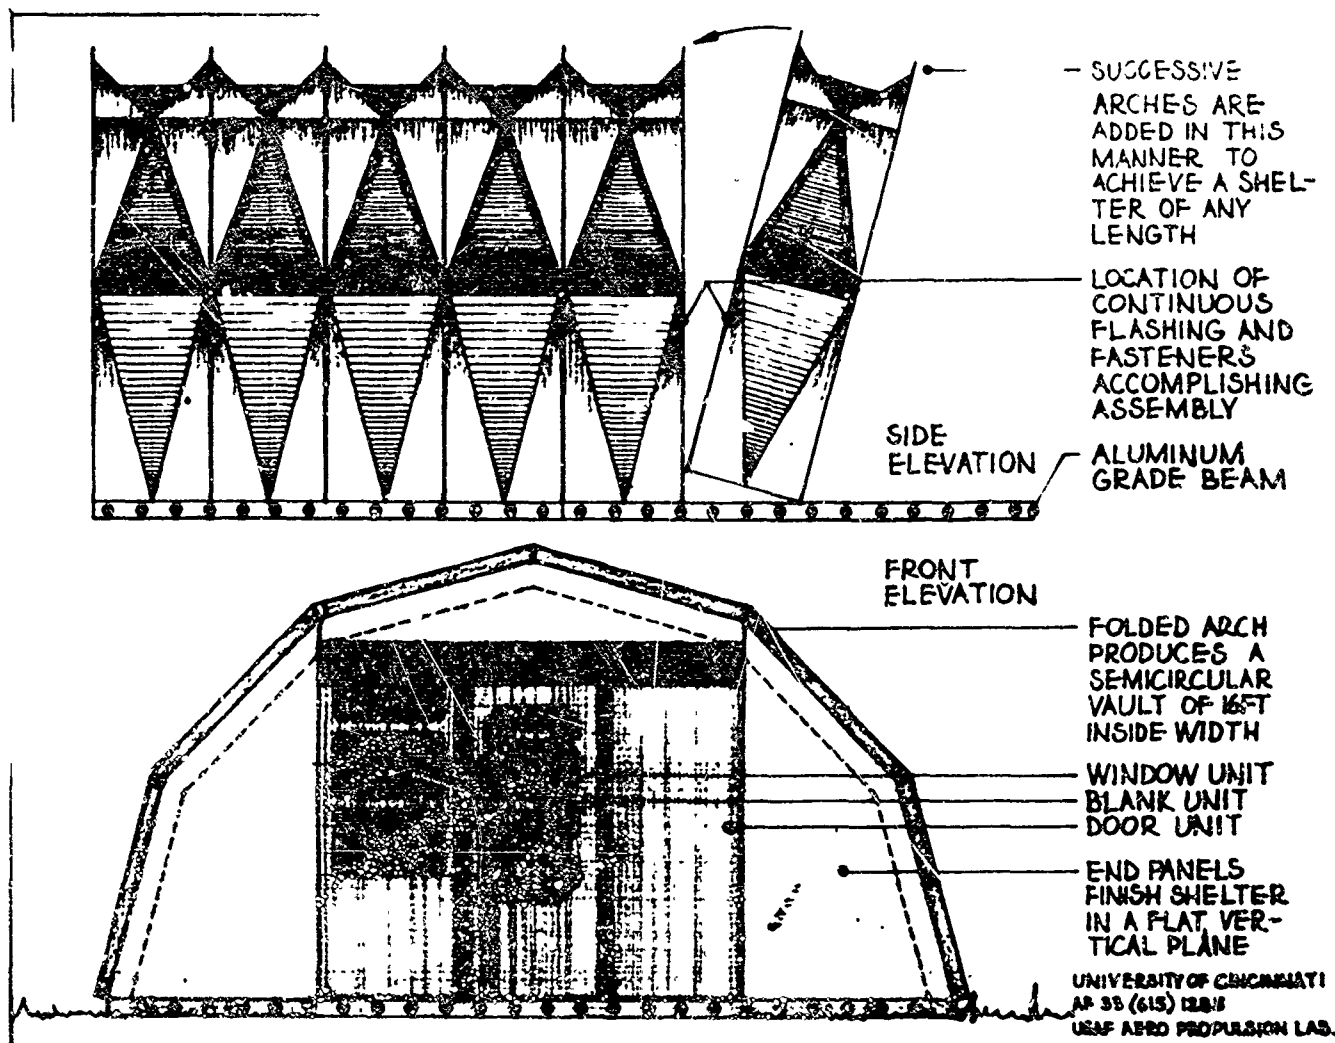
Drawing - Elevations of "folded diamond" concept shelter
